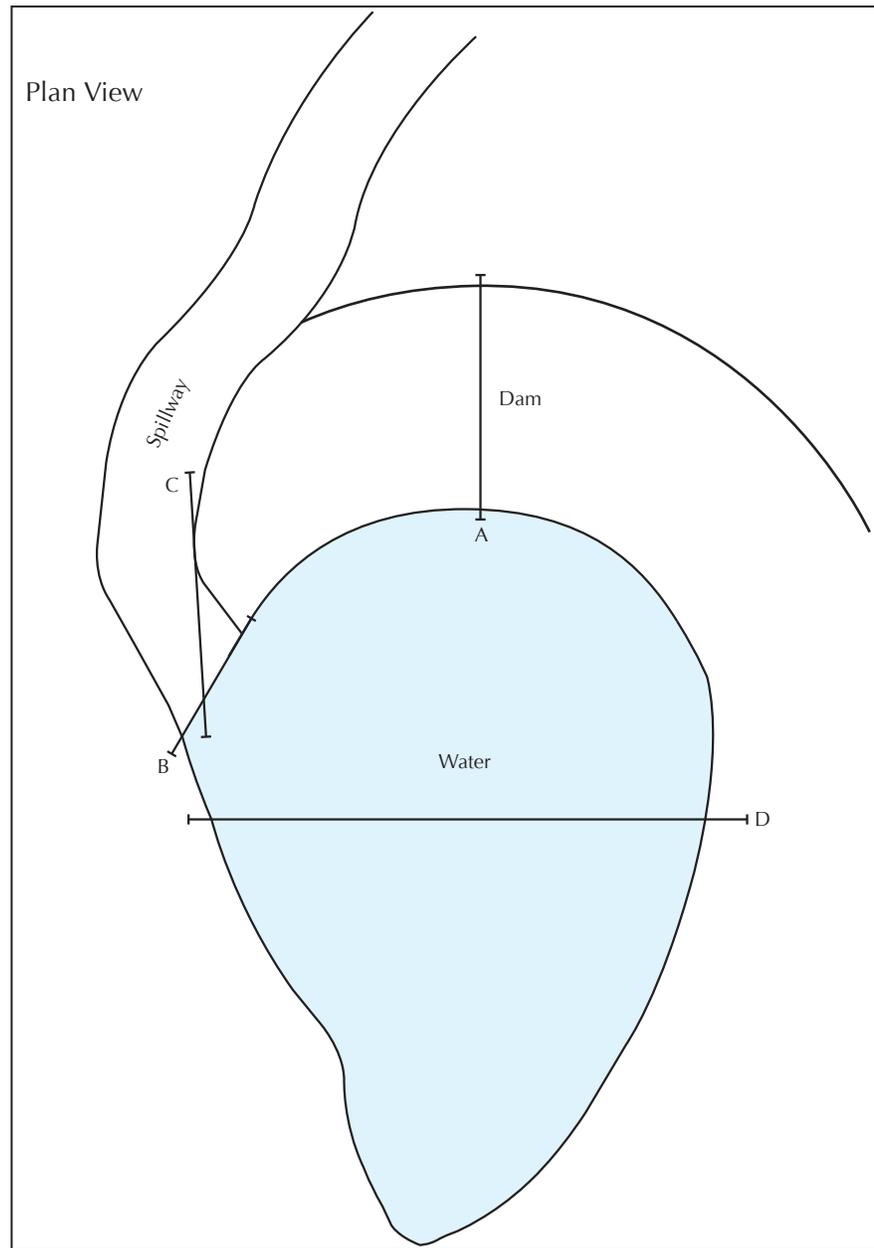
Wetland components and spillway construction in plan view. The spillway is to one the side of the dam.
